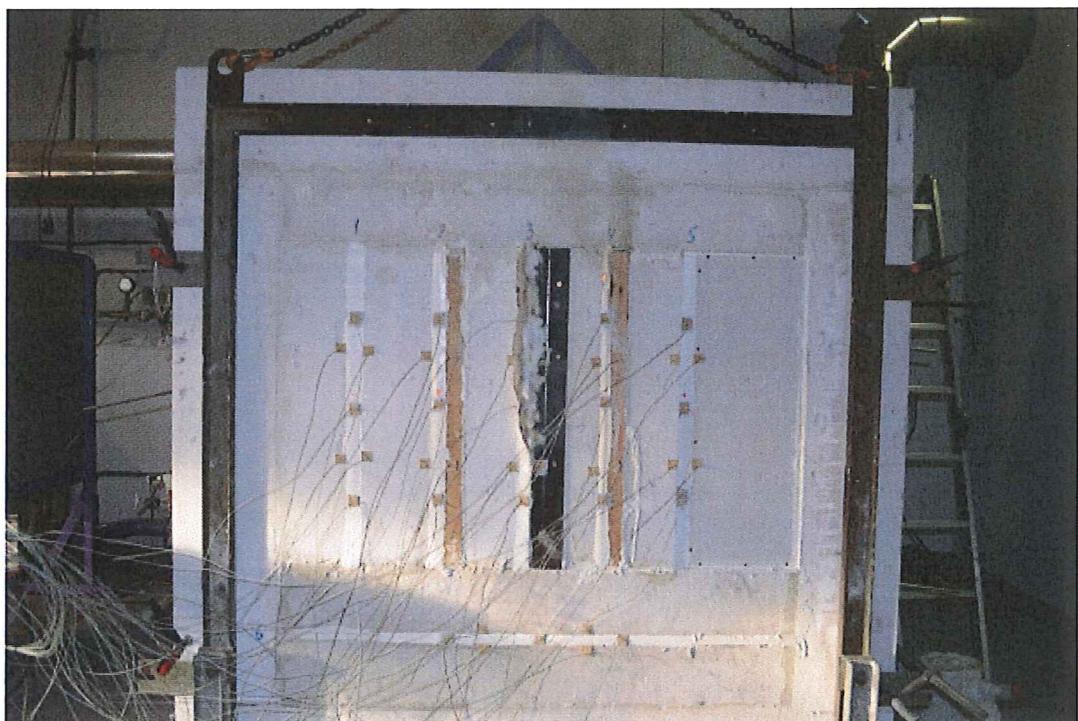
Unexposed side of test specimen after 90 minutes of testing
